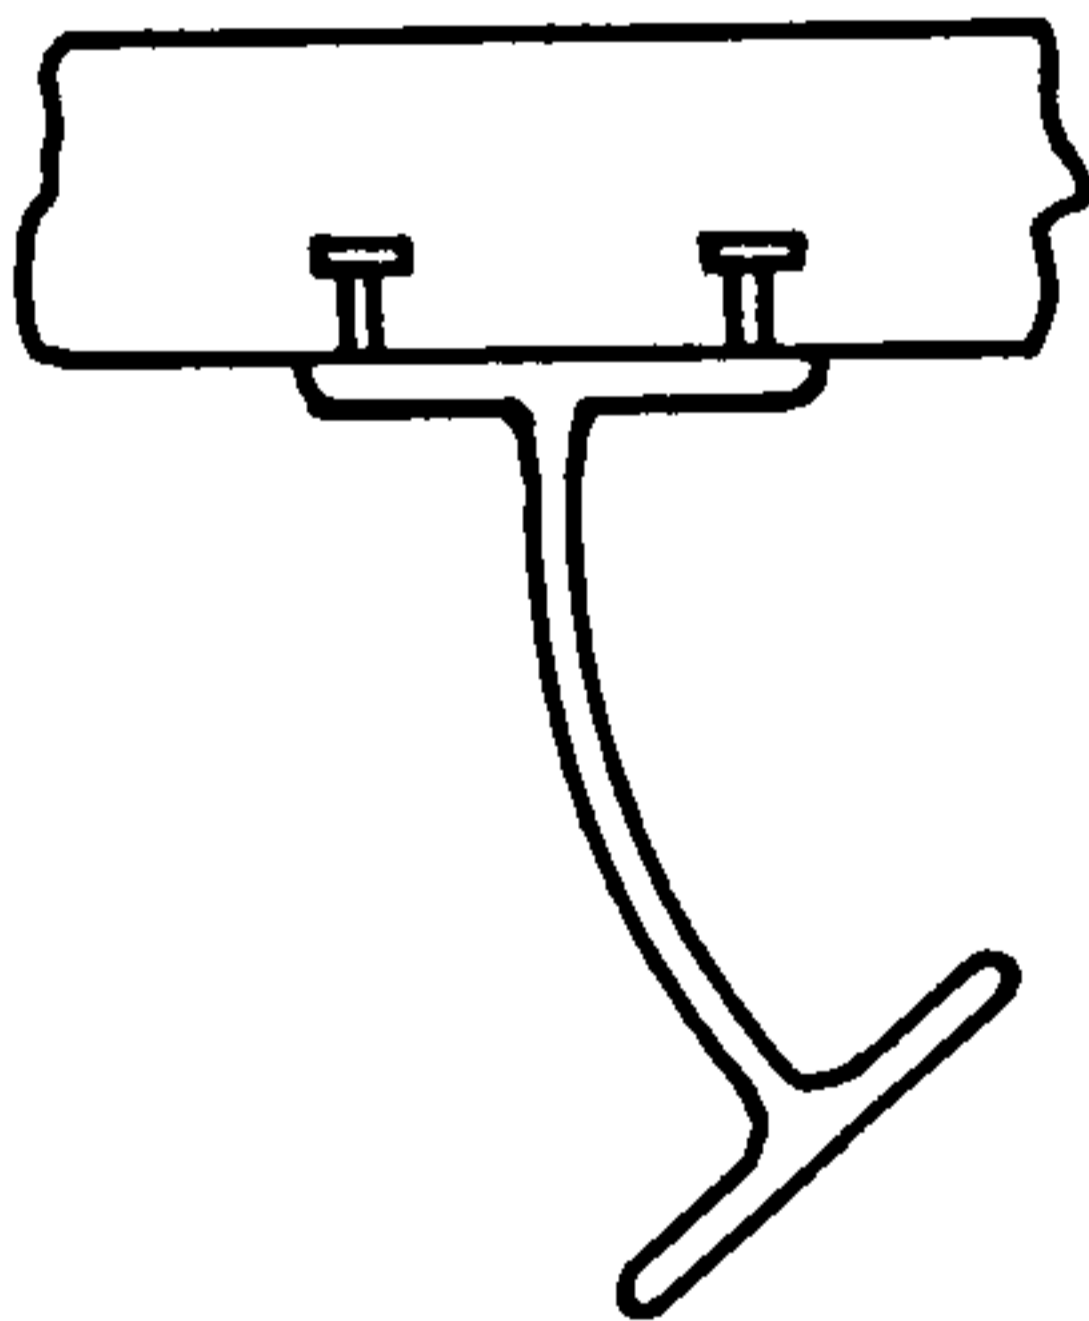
Distortion of a girder cross-section braced by concrete deck
